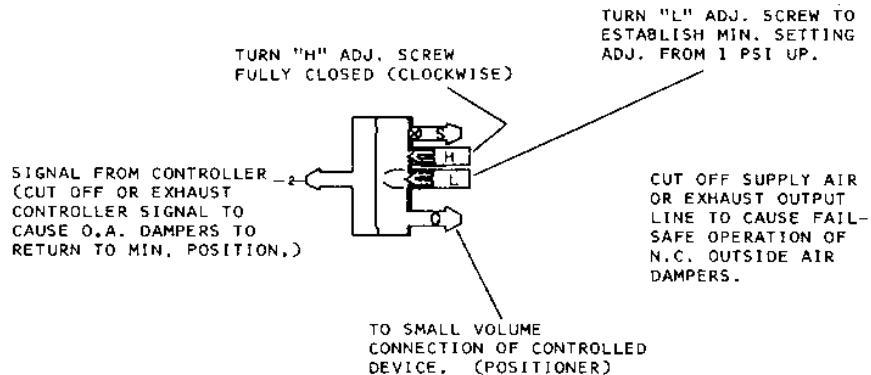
C-5230 Used as Minimum Setting of N.C. O.A. Dampers
